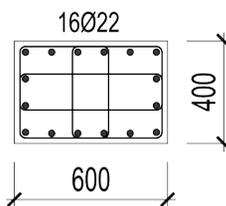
Longitudinal Reinforcement Layout – Column 6C
